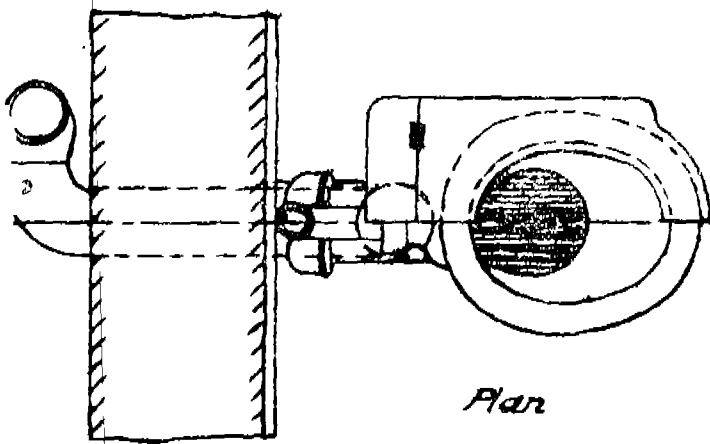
DETAILS OF W. C. FITTINGS SHOWING CONNECTIONS TO SOIL PIPES.
